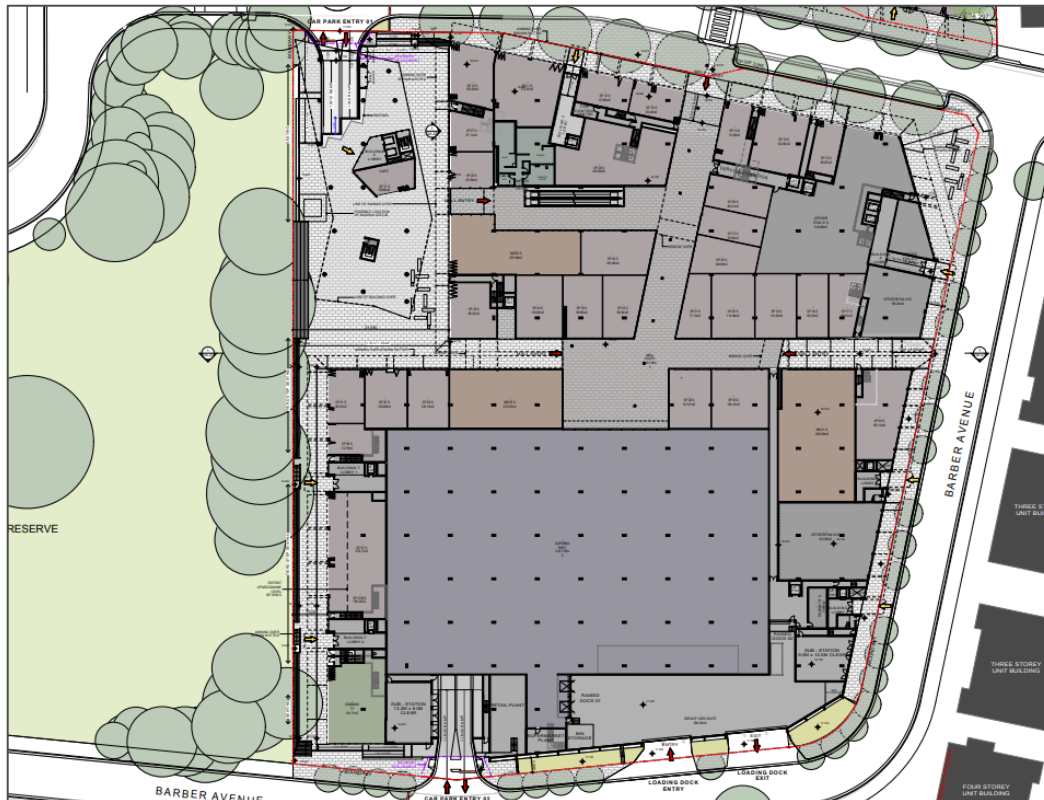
| Approved South Site ground floor retail layout (source: Approved Plans MP09_0146)
